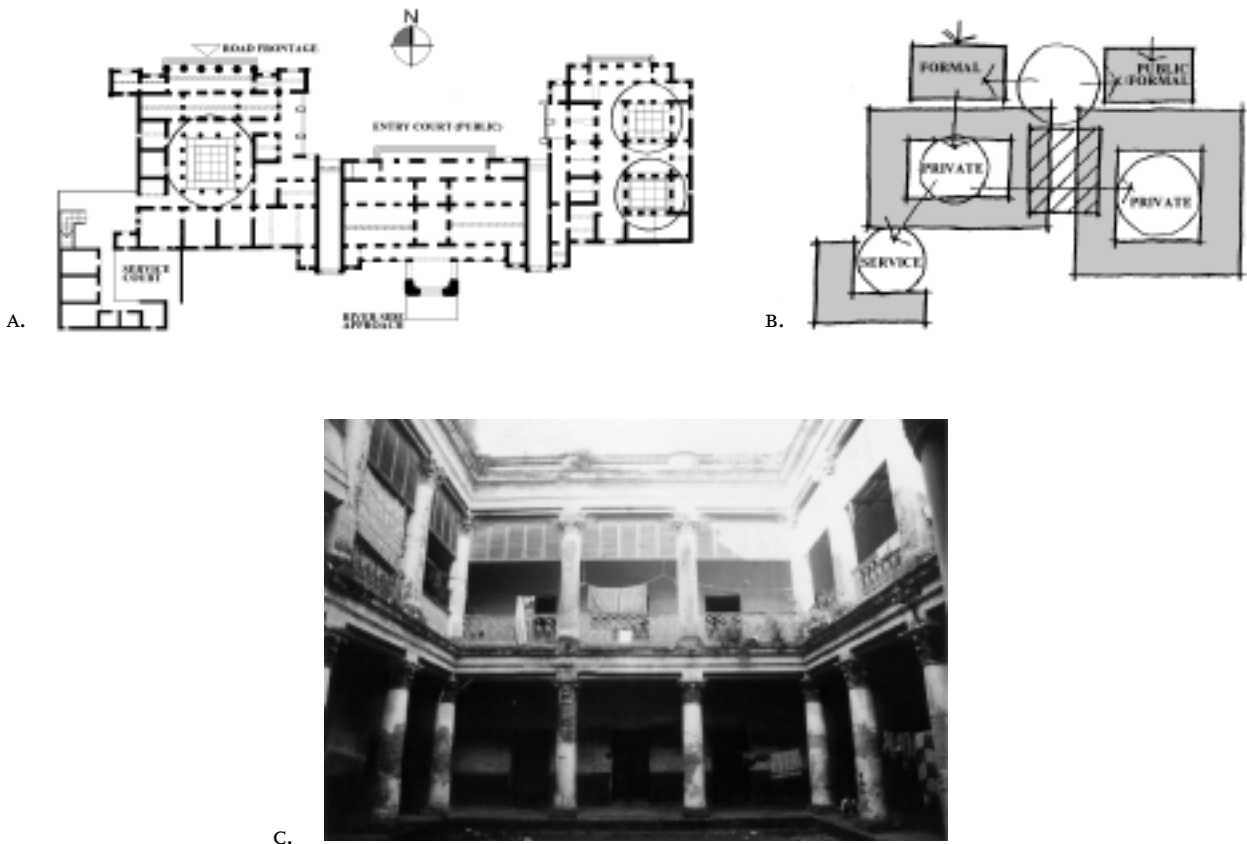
A) ground floor plan. B) articulation of zones. C) photo of main internal family court.
